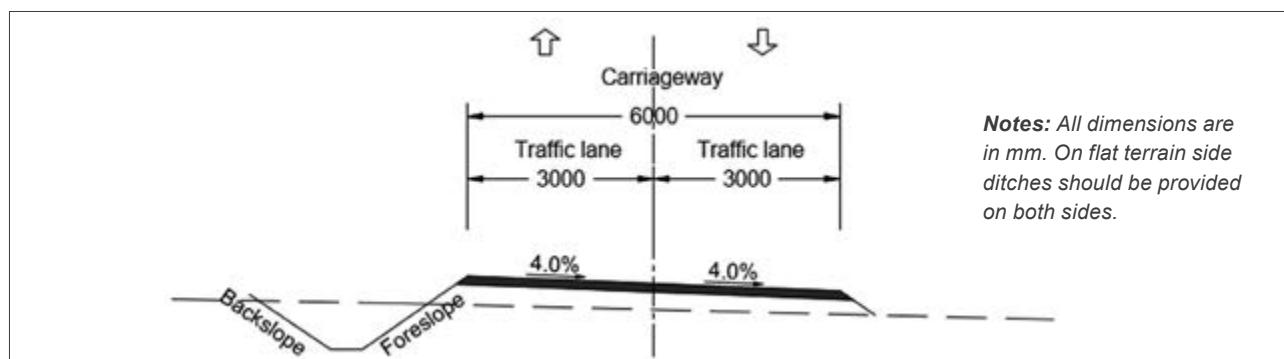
Single Carriageway Type R7 with Super-elevation
